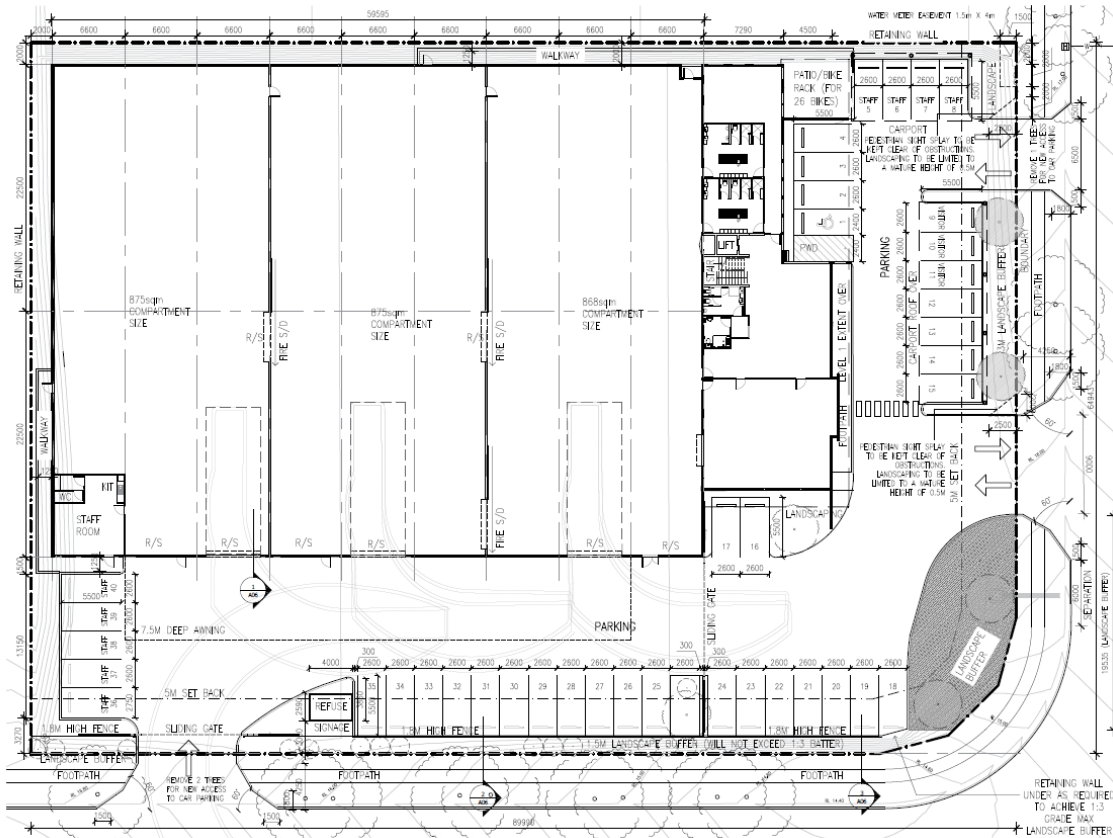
Proposed Site Plan (Source: Architects Dovey & Associates)
